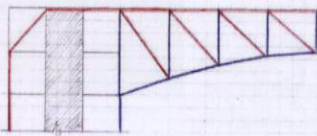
The truss scheme adopted for the cantilever beam. Minimum thickness is 10 m. Blue indicates compressed elements, red indicates the ones subject to tension.
